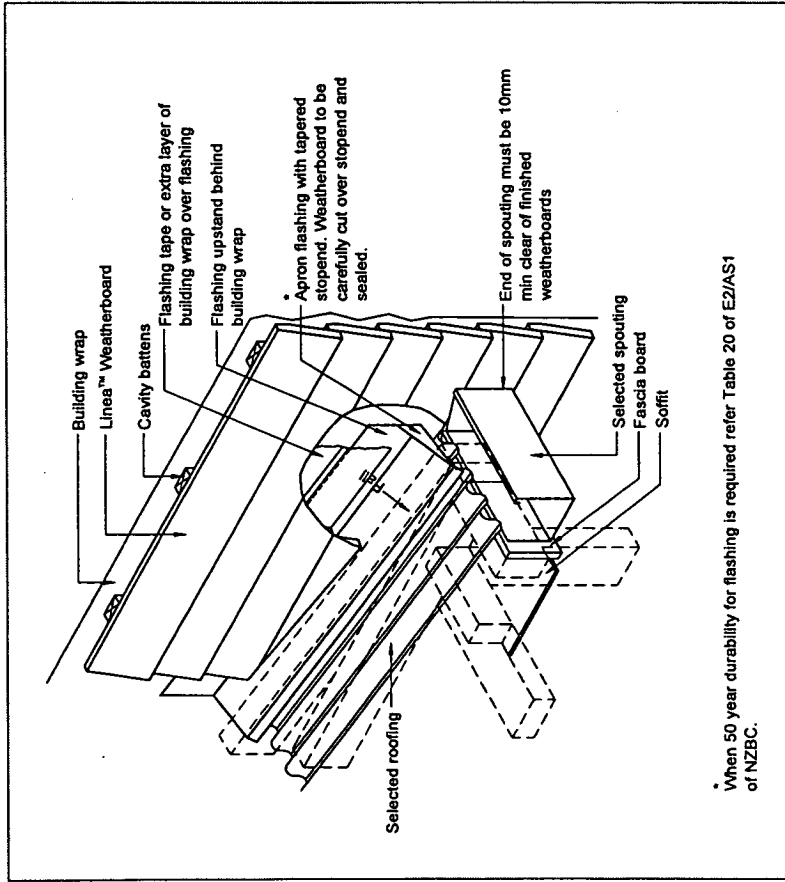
CAVITY ONE PIECE GUTTERWALL JUNCTION
